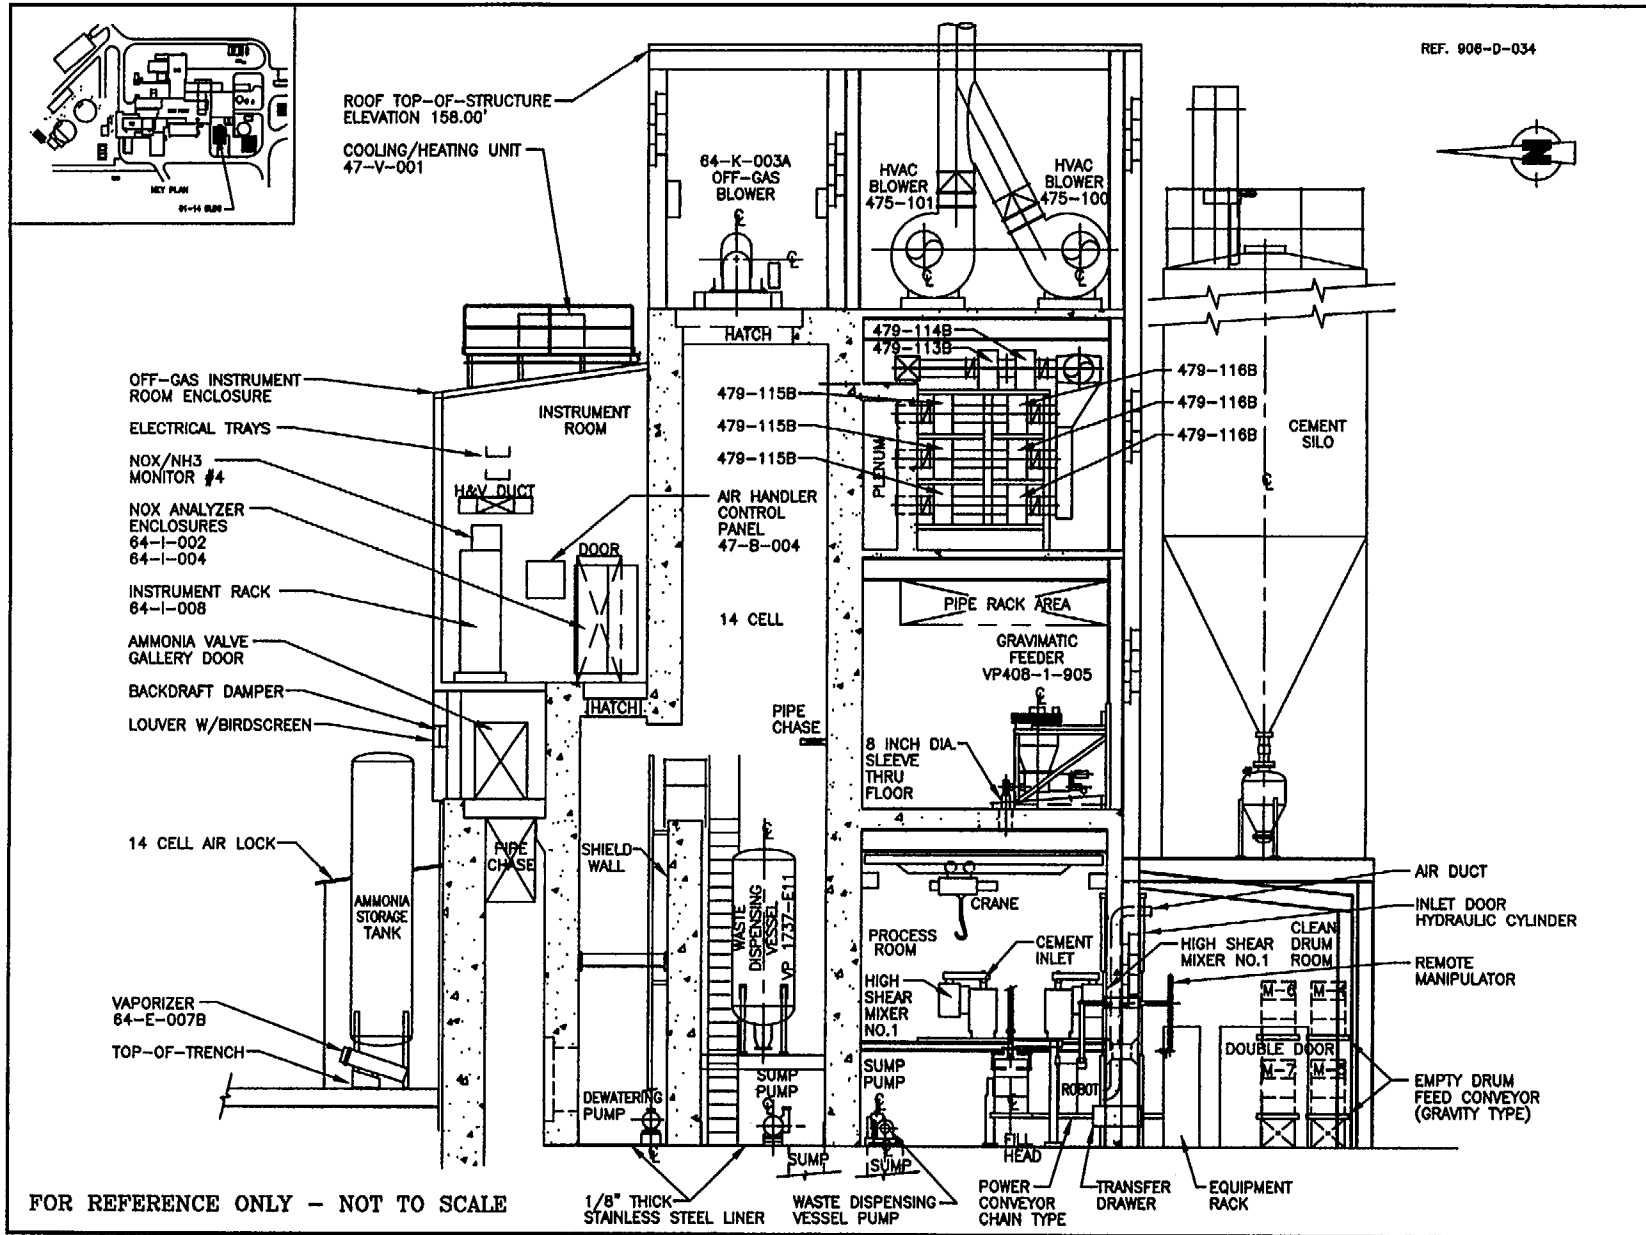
General Arrangement - 01/14 Building Sections
